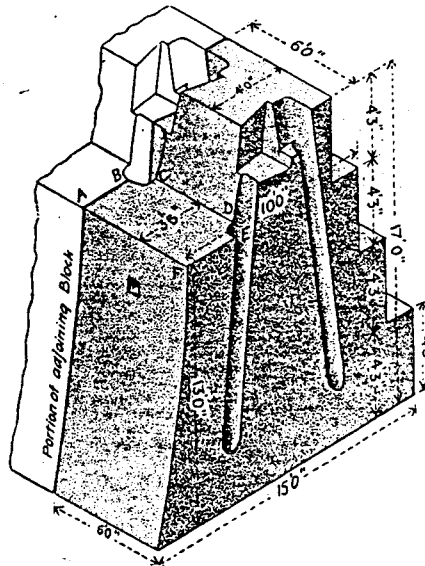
Concrete Block Used in Bulkhead Construction, New York.
